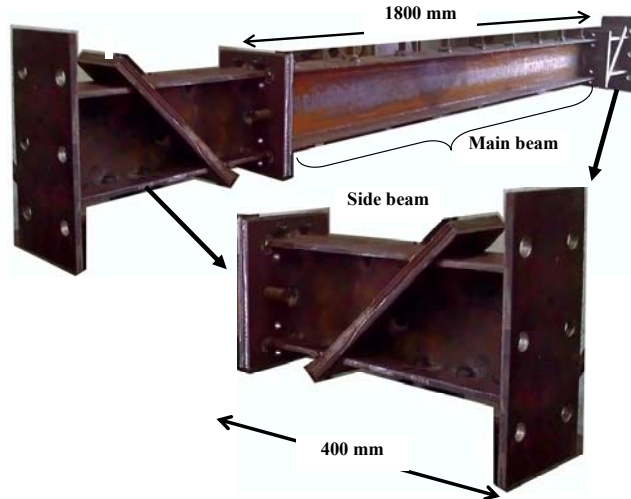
Parts of the Steel Beam with 45° Slant End-plate Connection (Full-scale Specimen)
